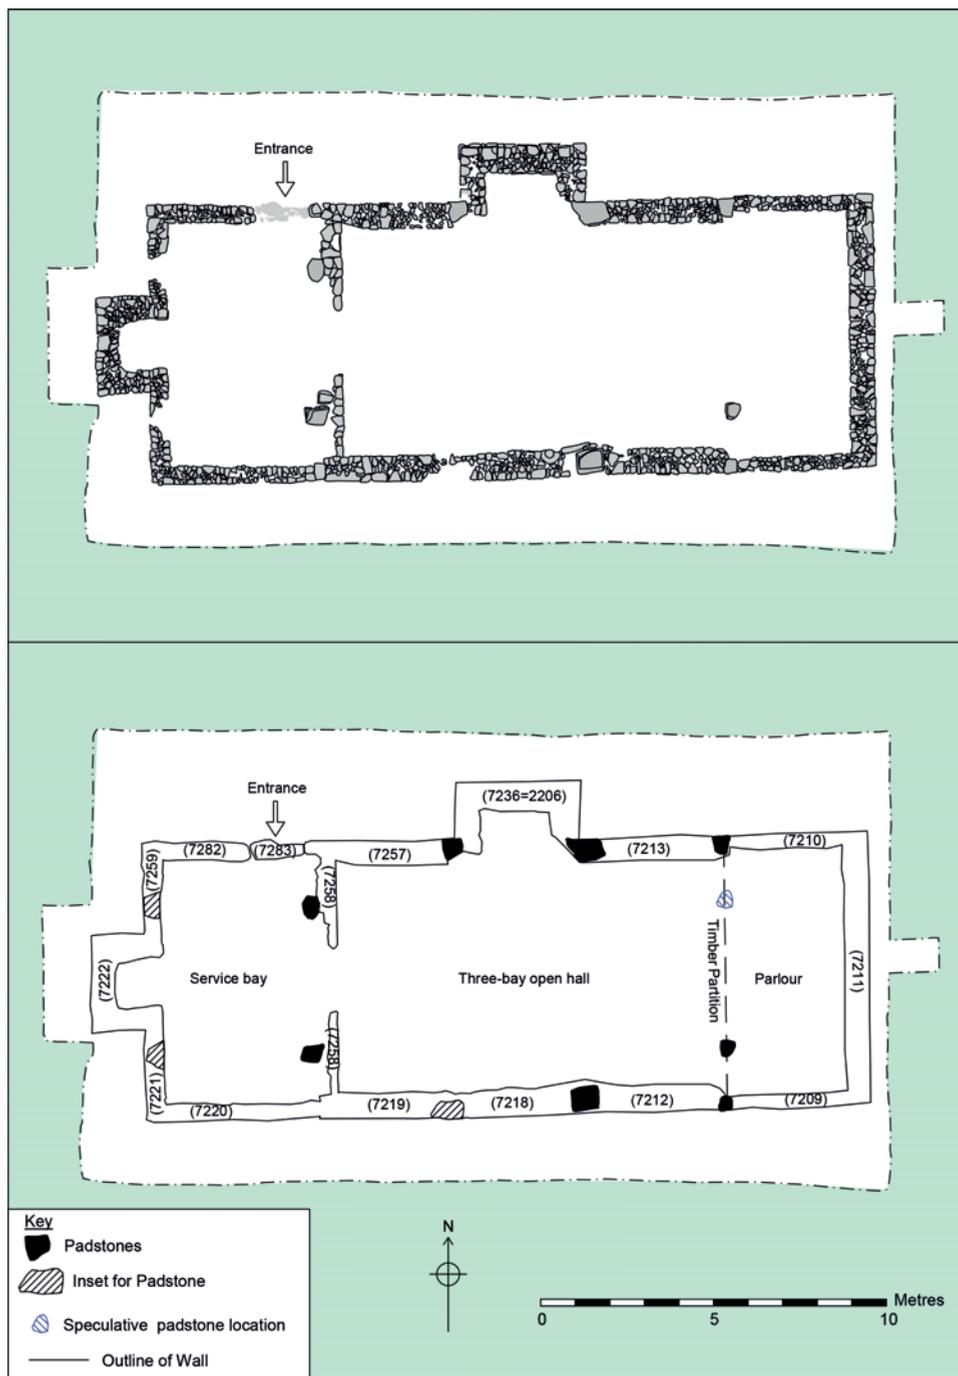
Plan of the structural remains of the timber-framed building (top: structural remains; bottom: schematic plan).
